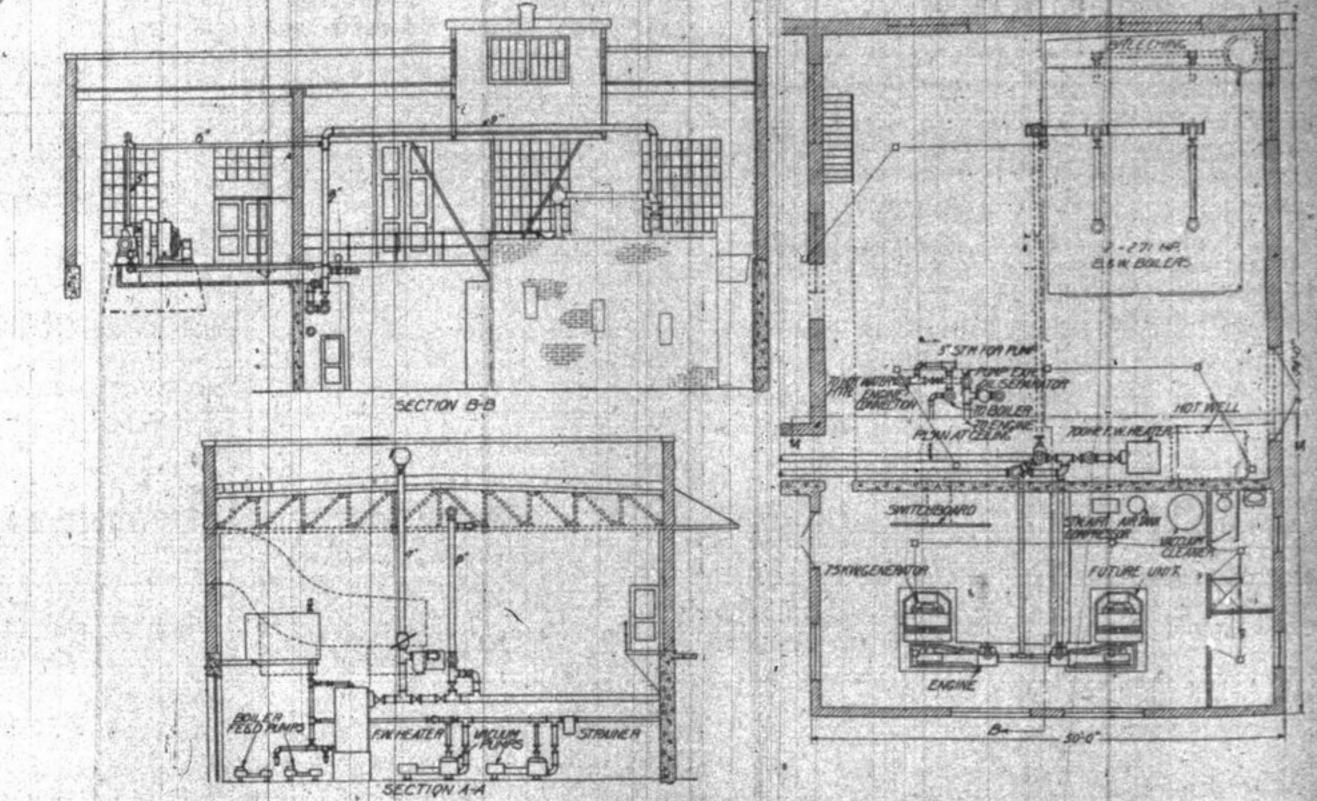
PLAN AND ELEVATION OF POWER HOUSE
